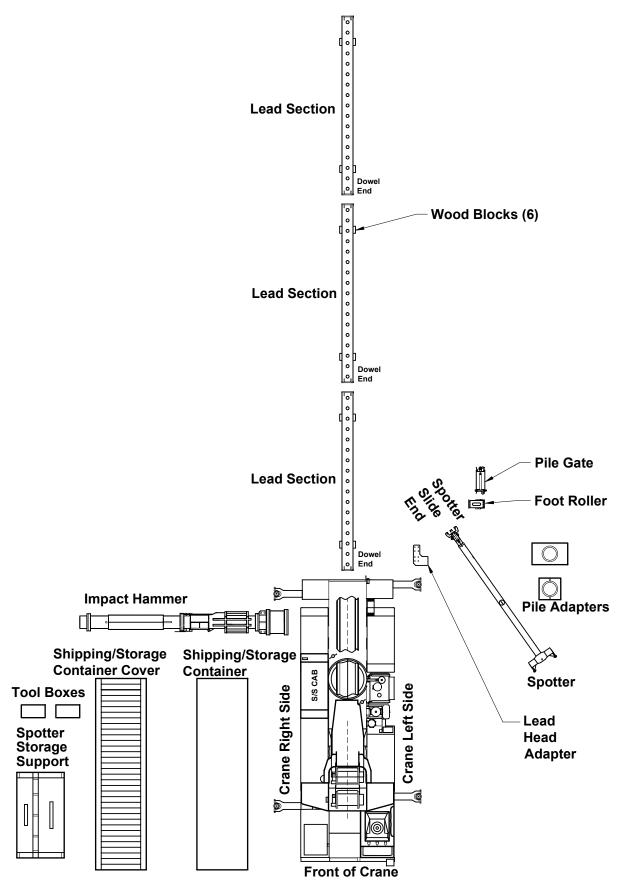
General Pile Driver System Components Arrangement (Pre-setup)
